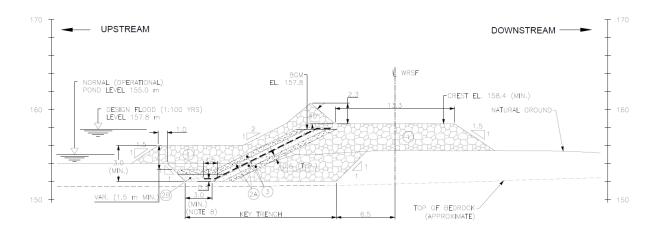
Typical Cross-Sections of WRSF Dike (Without Thermal Berm)
